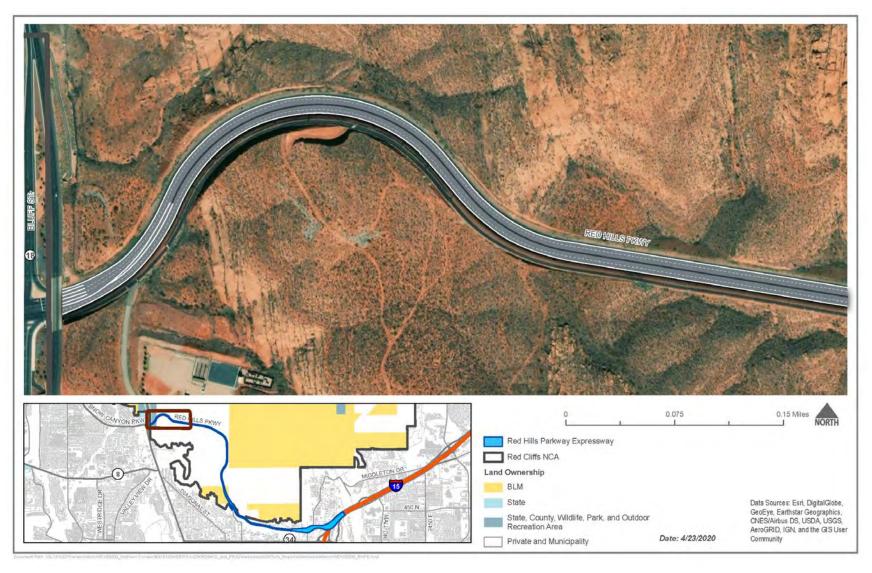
Red Hills Parkway Expressway Plan View (1 of 7)
